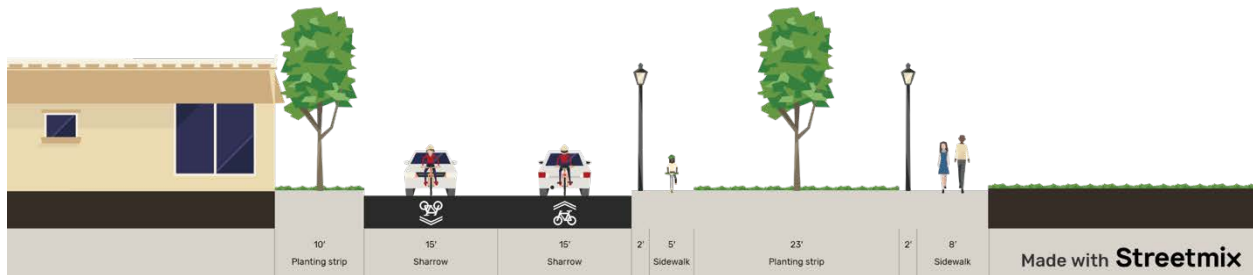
Proposed cross-section of Stevens Street looking North, near the playground. The new design proposes a sidewalk along the driveway. It includes a shared bike lane with a driveway. Bike sharrows will be added to the road. It also suggests restricting on-street parking; the drive lanes will become wider. It proposes to add street light infrastructure along the sidewalk. Diagram created in Streetmix by EC, 2022.
